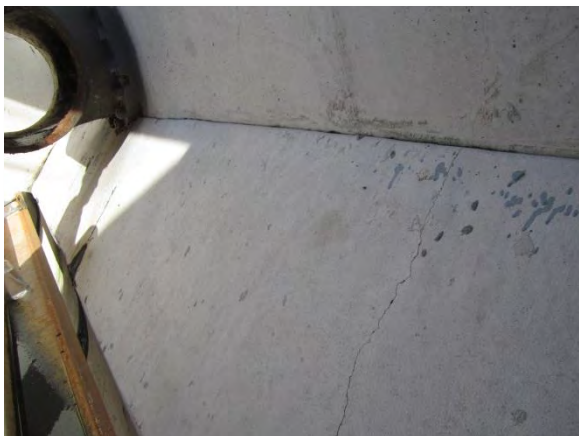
Minor cracking in tapered fill concrete at east wall of SST 2.
